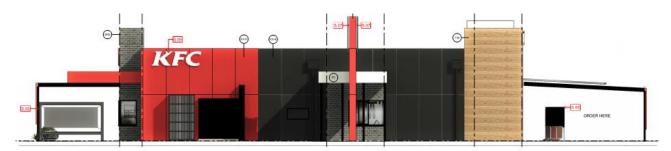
Northern elevation as viewed from the Bass Highway (Source: Urbis report p.100)
